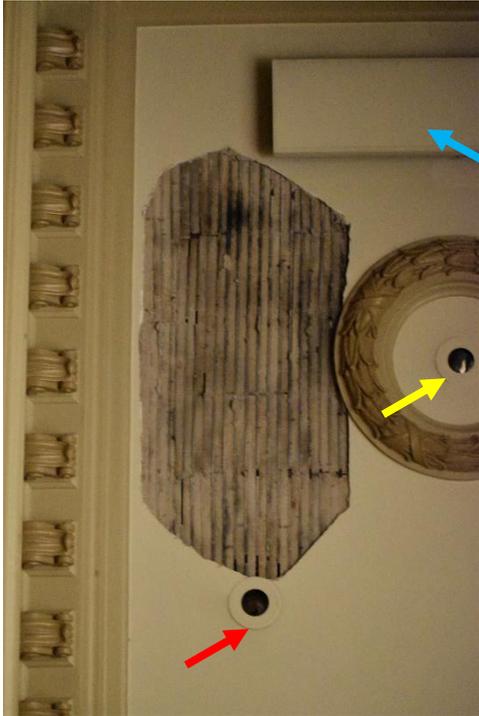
Area of plaster failure, looking overhead (Bay S2). West is oriented up.
